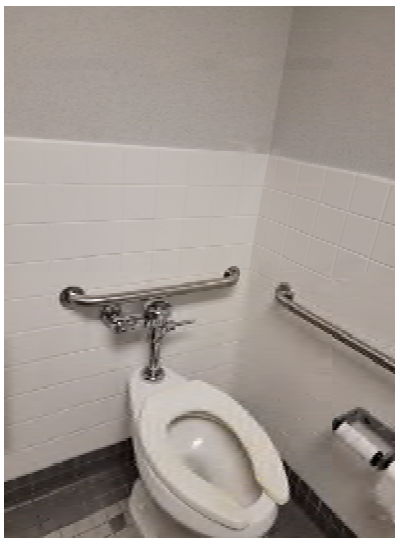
Jamestown Fire Station Toilet Room Grab Bar View 2
